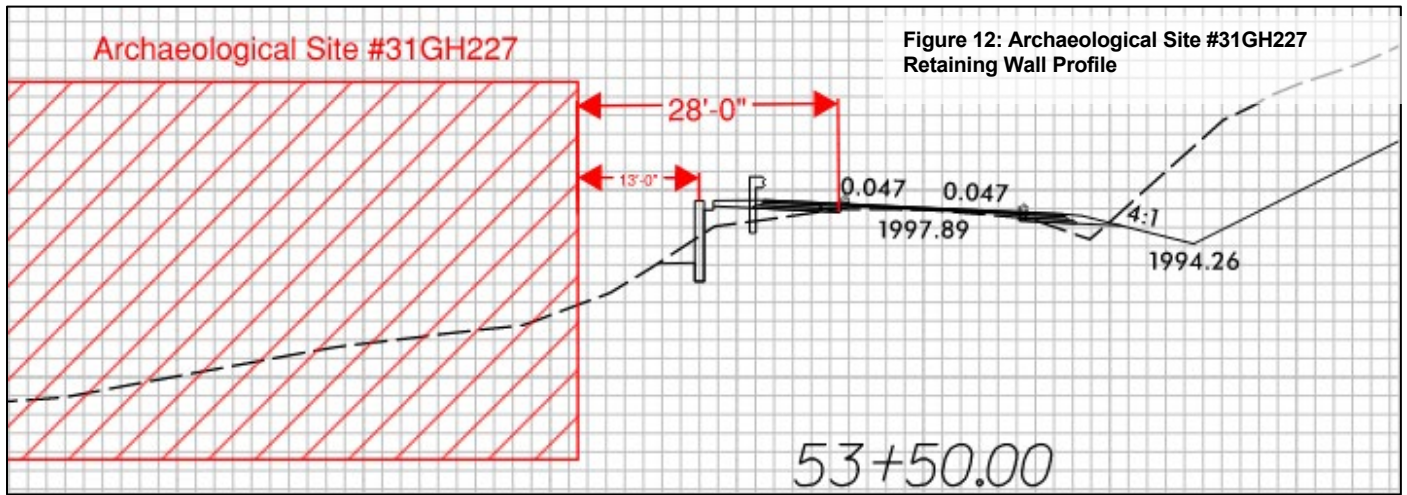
Archaeological Site #31GH227 Retaining Wall Profile
